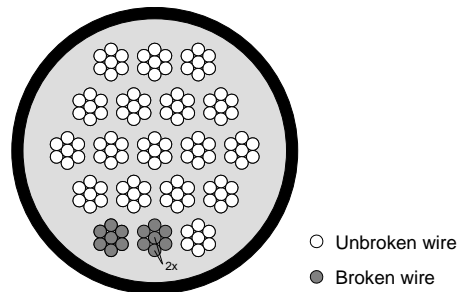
Opened Wedges and Wire Fractures for Strand 2 near Tower Anchor Head – Specimen 2
